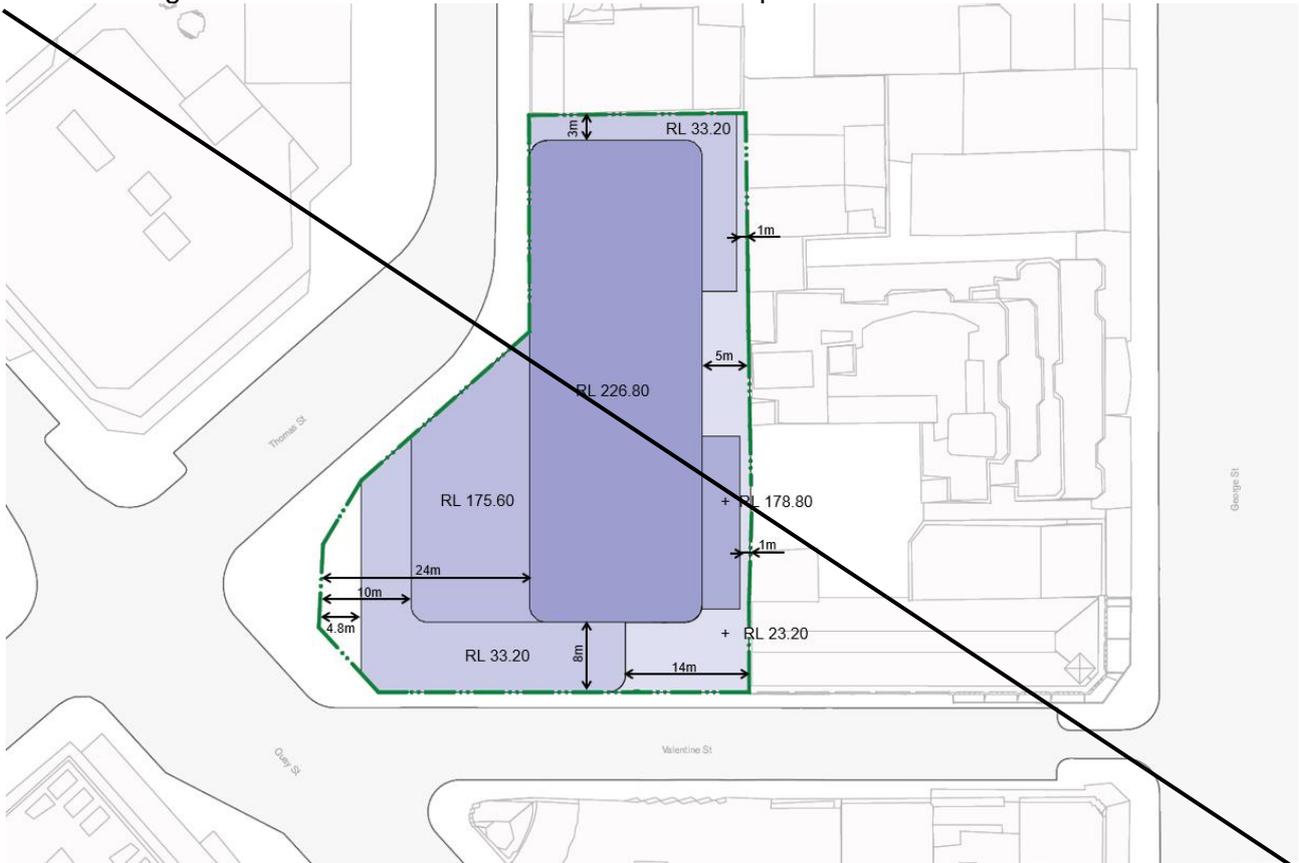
XX 187 Thomas Street, Haymarket – Indicative envelope – void tower floor plan
